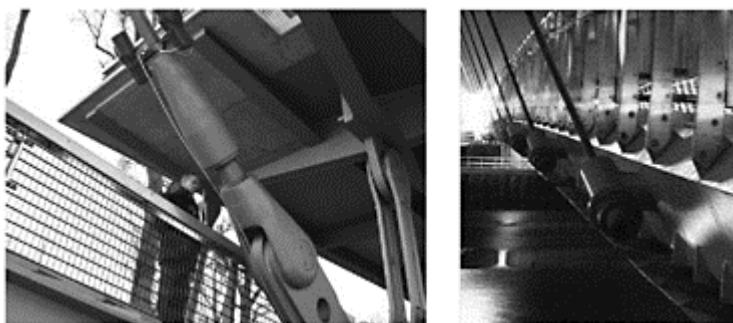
Deck connection details of Pedestrian Bridge Strasbourg/Kehl (France/Germany, 2003) and Swansea Sail Bridge (UK, 2003).
